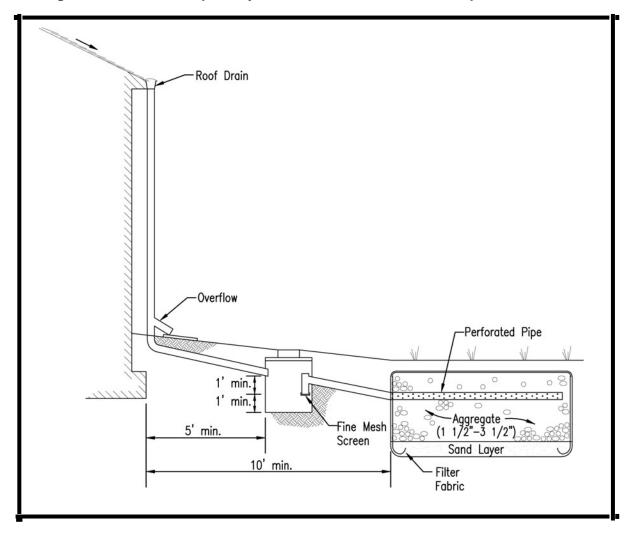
Roof Downspout System with a Pretreatment Sump Basin
